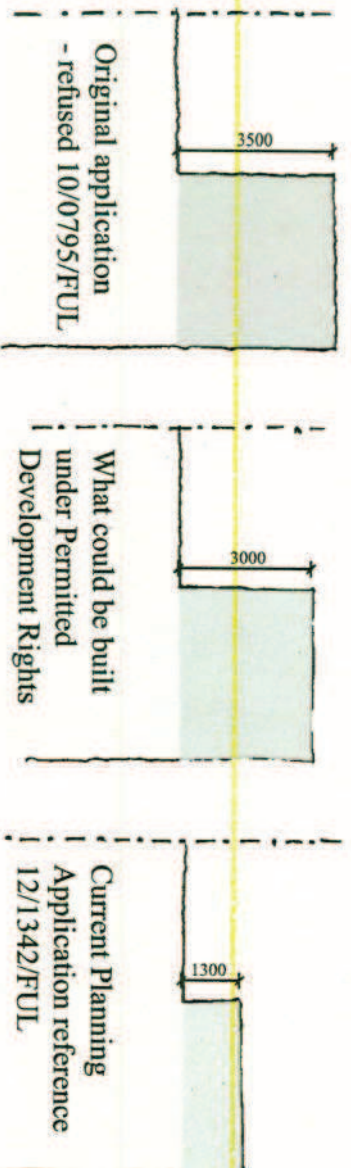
Diagram showing first floor size of previous refused application, what could be built within permitted development rights and what is applied for under this application
